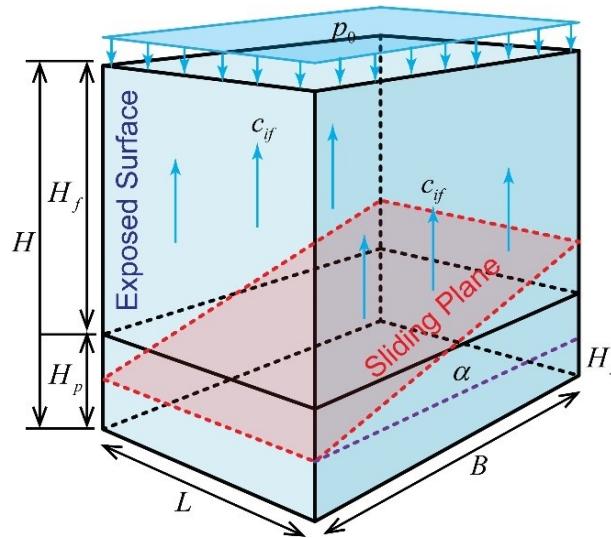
Interaction between a typical cemented backfill column with an exposed sidewall and the surrounding rocks.
